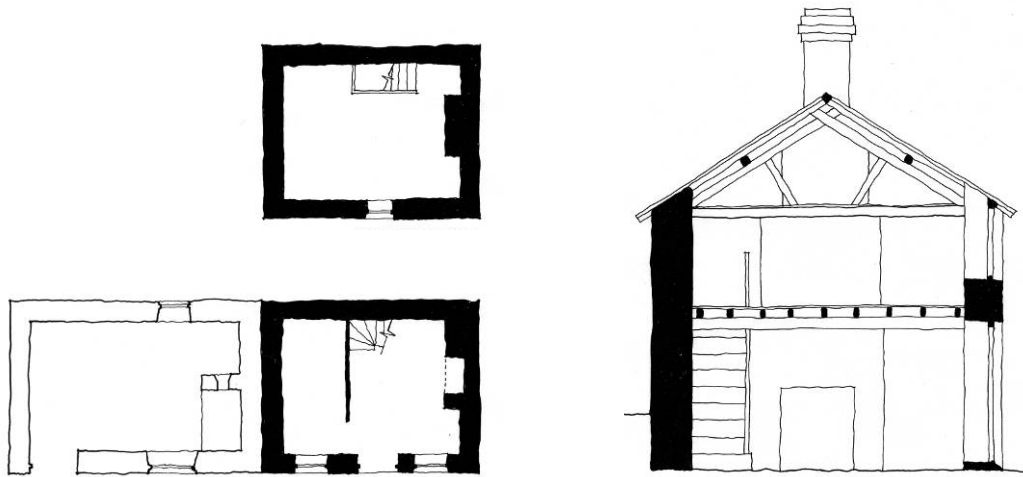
Plans of Nant-gwyn Smith shop and adjoining house, the blacksmith's workshop was erected after the house was built; Fig.5.10 Section through house
